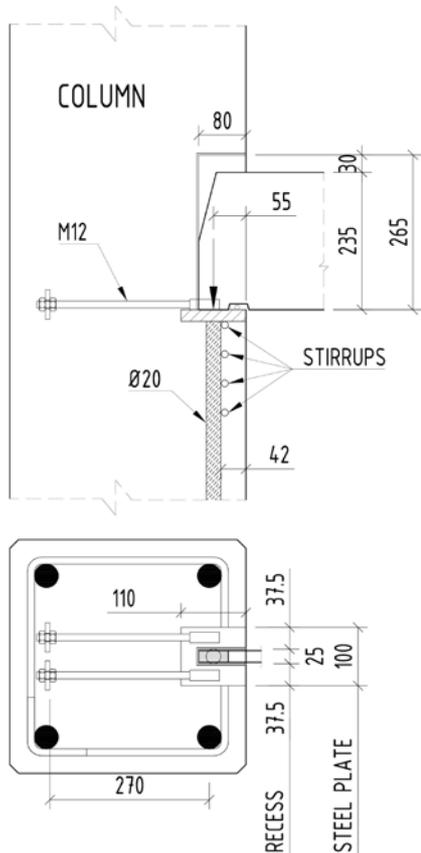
BSF300 column unit. (Centre stirrups are not illustrated.)
